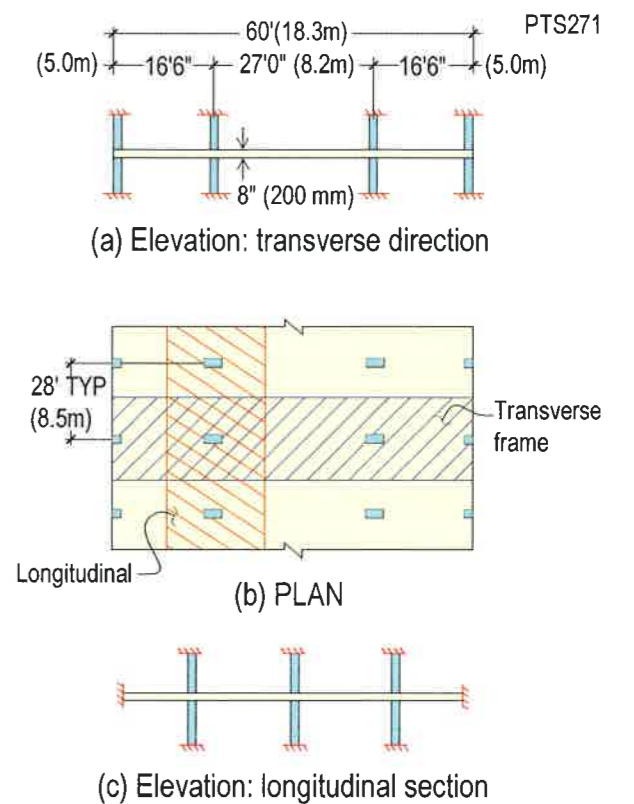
Typical Dimensions of a Post-Tensioned Flat Slab Parking Structure in the USA (The figure also displays the design strips)
